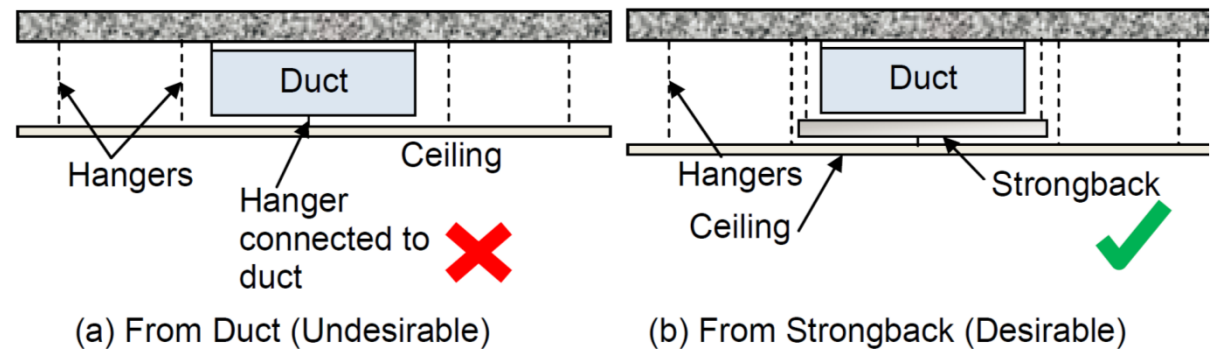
Suspension of Ceiling Hangers around Ducts
